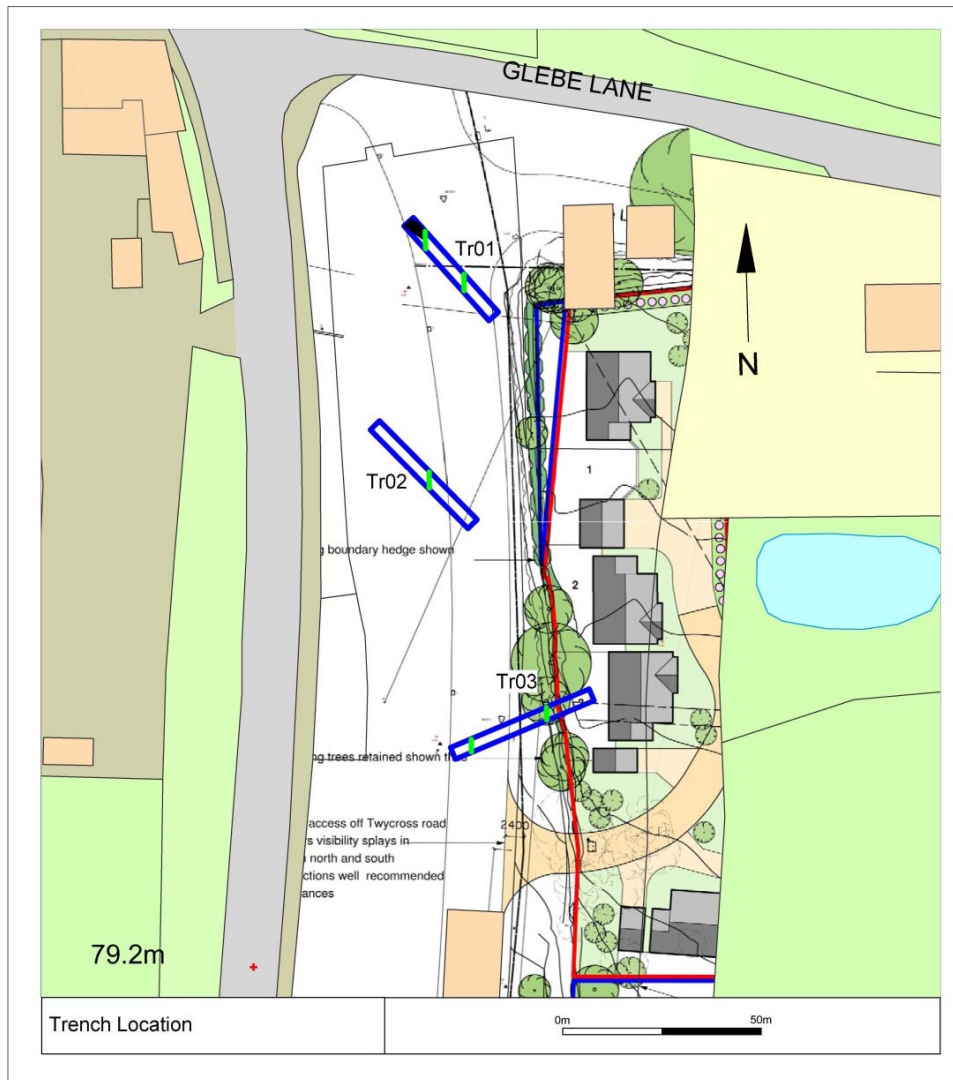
Trench Locations showing approximate locations of furrows (green) and ditch in Tr01. Plan provided by the client.
